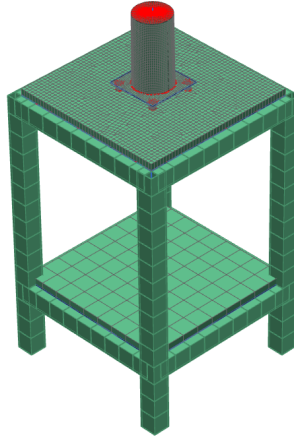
Turbine base structure using beam and shell elements with cross-sections represented
